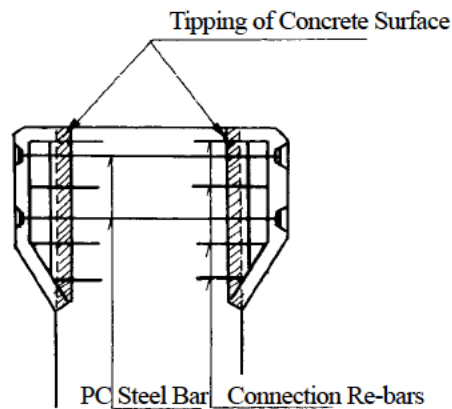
Widening of Seat Concrete (Sandwich Widening)
